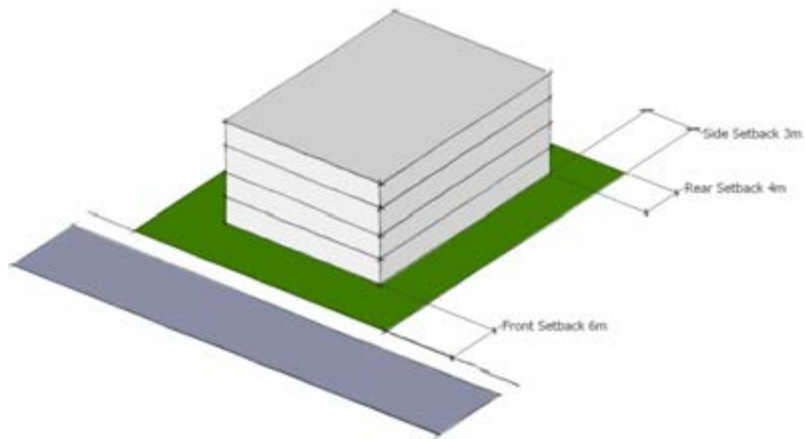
c – Setbacks – 3 or 4 storey Multiple dwellings
